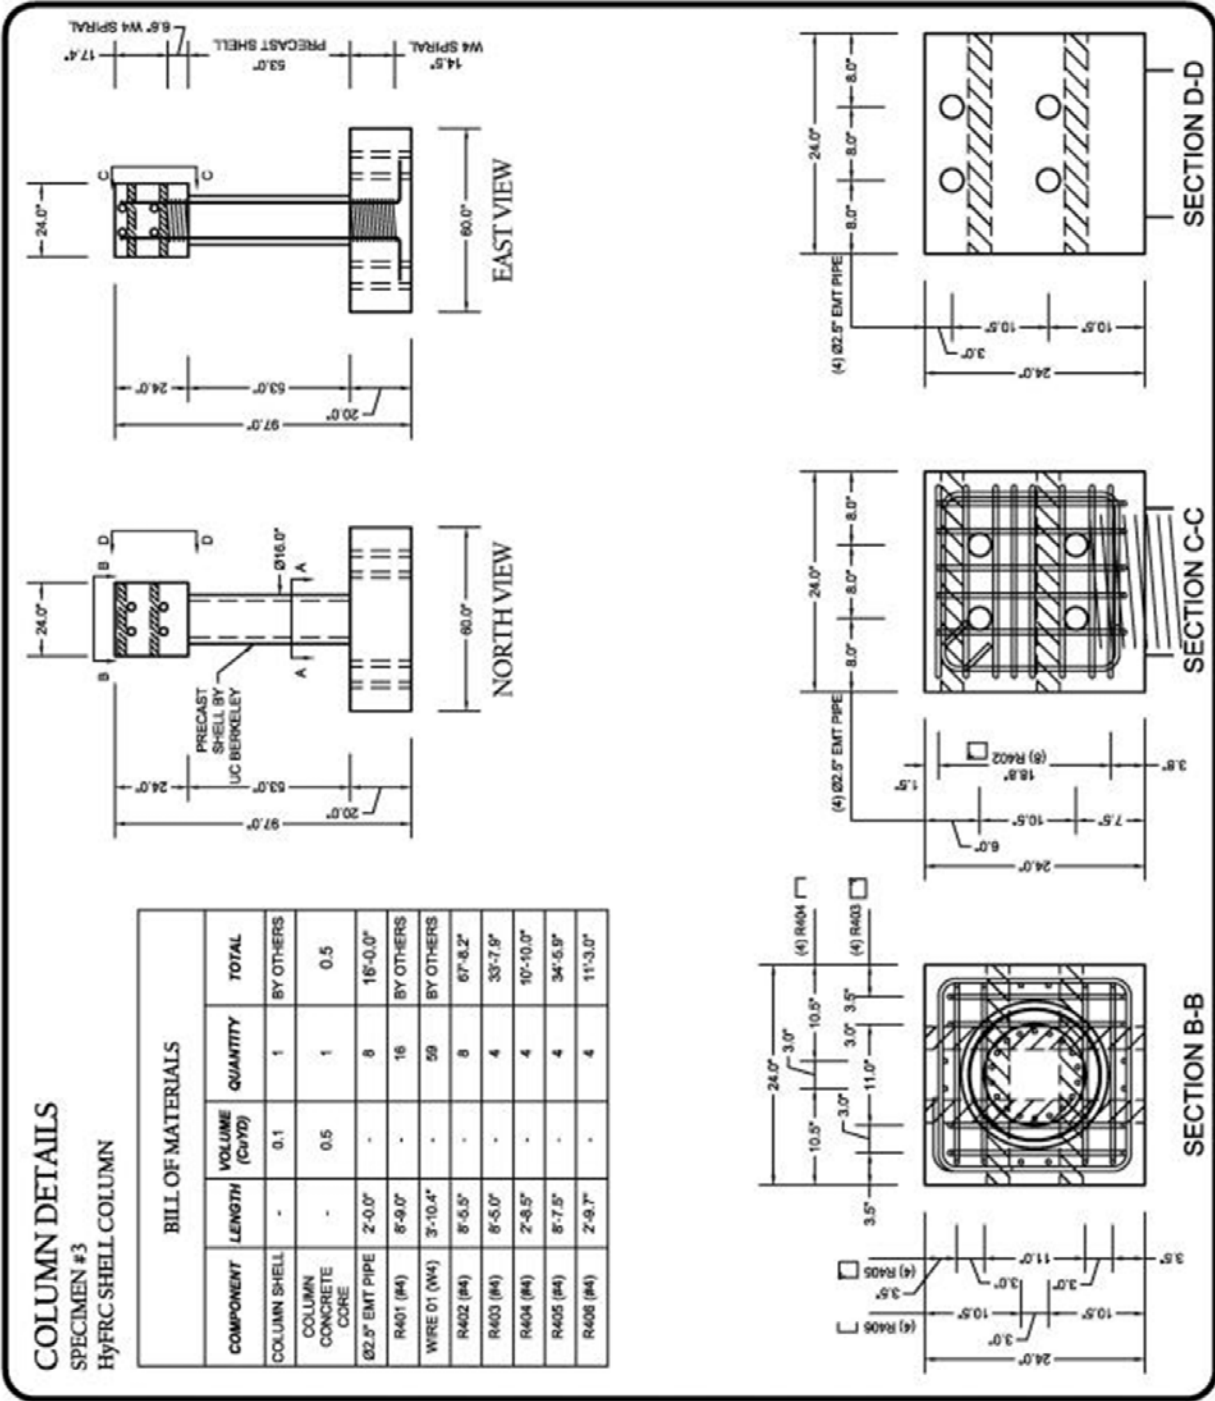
Reinforcement for column load stubs and footings (cont.).
